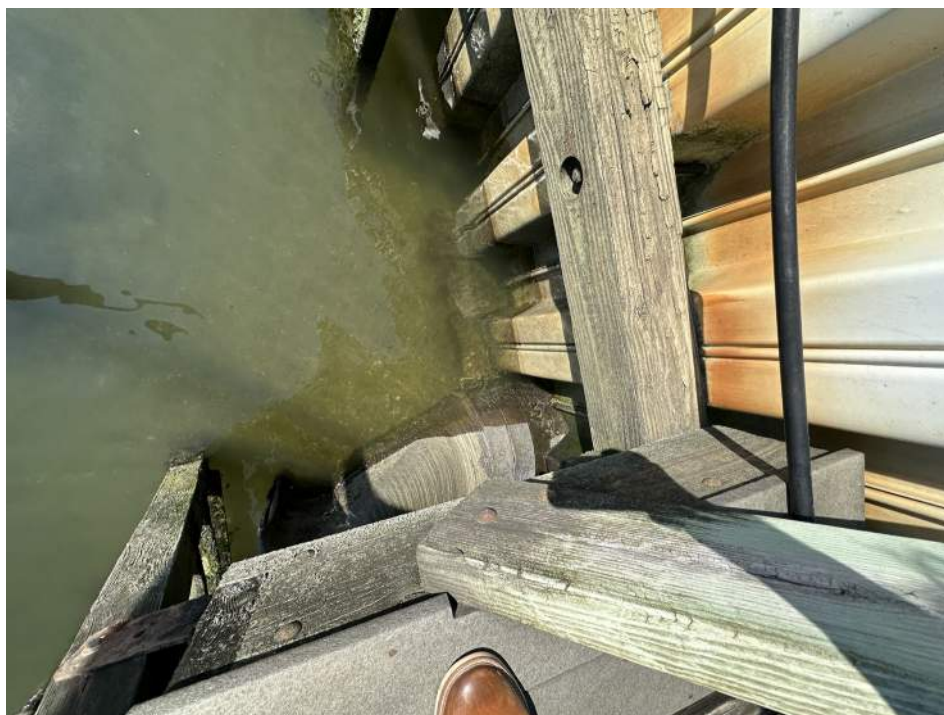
Section C, Westerly Bulkhead, Outfall Pipe with Outfall Backflow Preventer (Tideflex)
